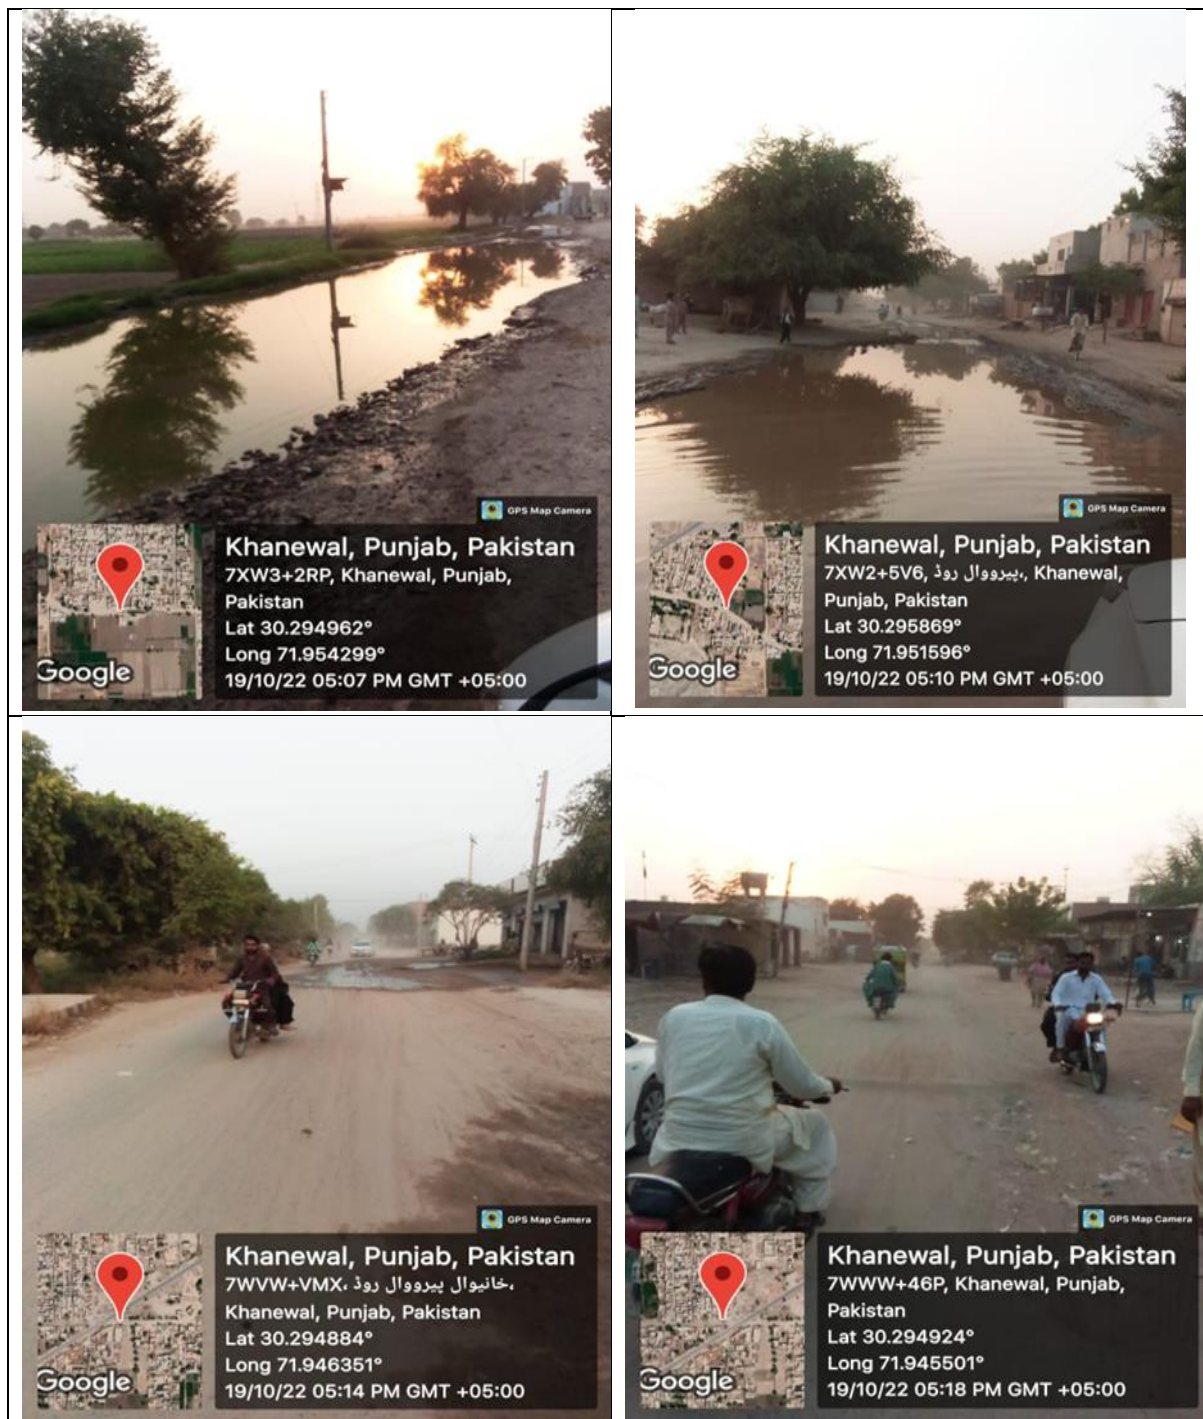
Jaswant Nage to Chack 88/10R Road Khanewal
